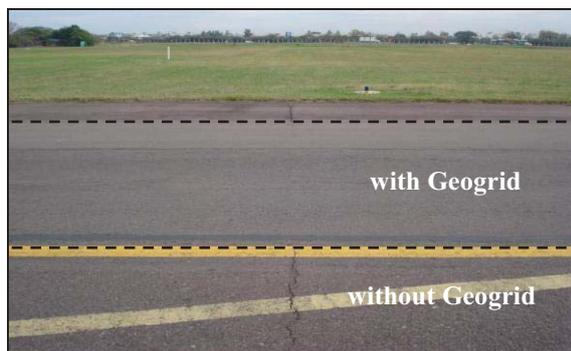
Joints of the concrete slabs reflect in the area where no reinforcement was used
